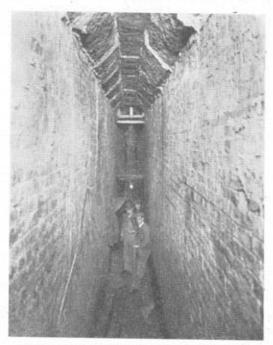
One of the Cavities between the "Spandrel" Walls,
